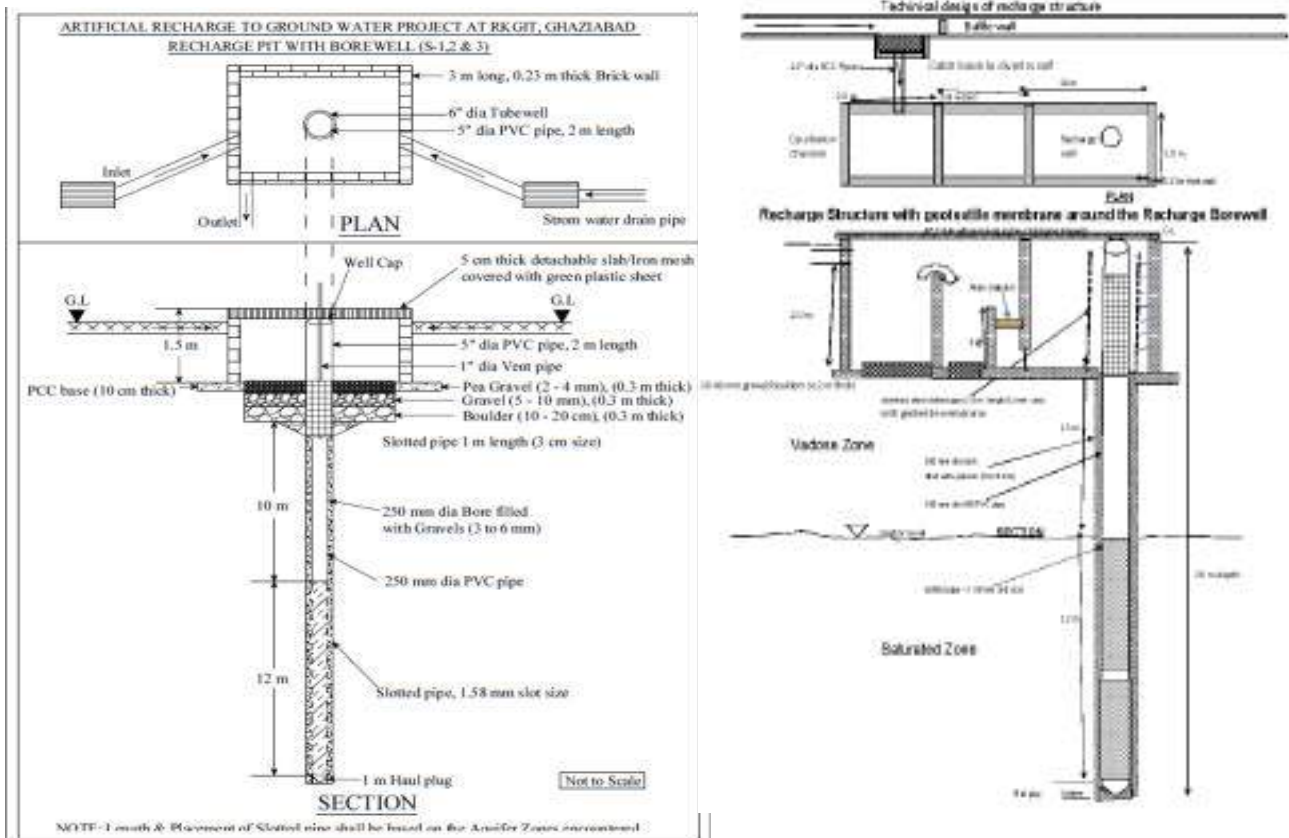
Design of proposed rooftop rain water harvesting structure
